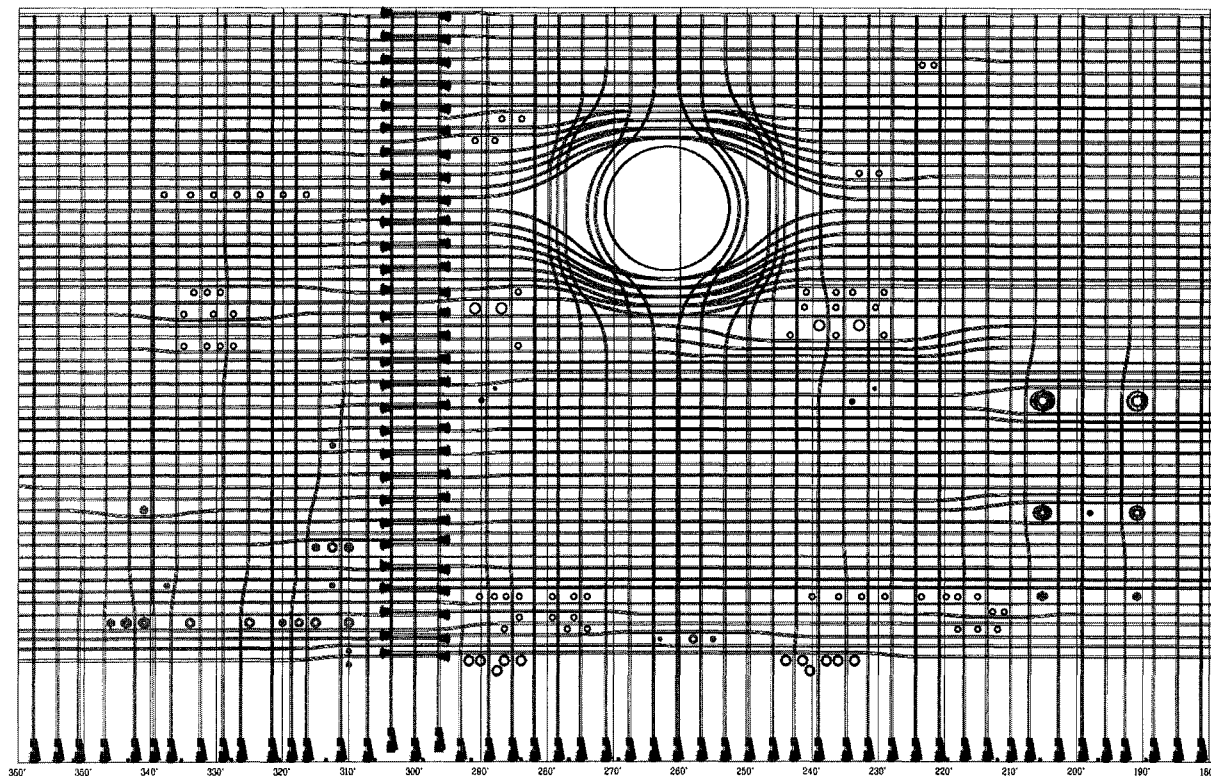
First half of the spread plot depicting the post-tensioning system in cylinder wall
